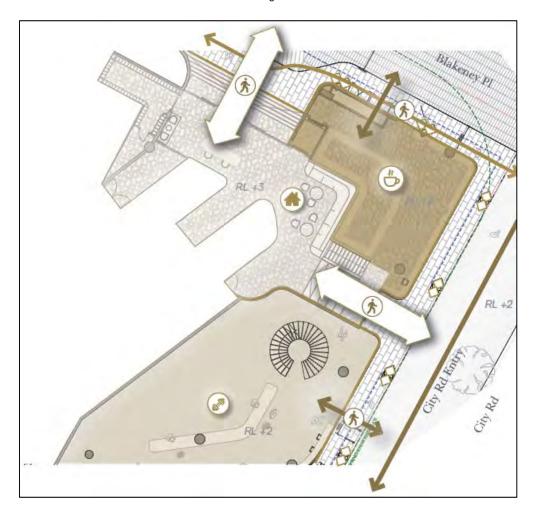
Ground floor activation associated with food and drink premises and gym (Source: Applicant)
